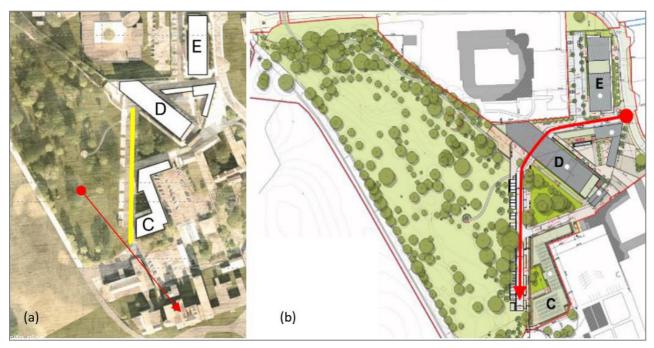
(a) Revised site layout configuration and (b) revised access arrangement for Phase 2 The Farm
